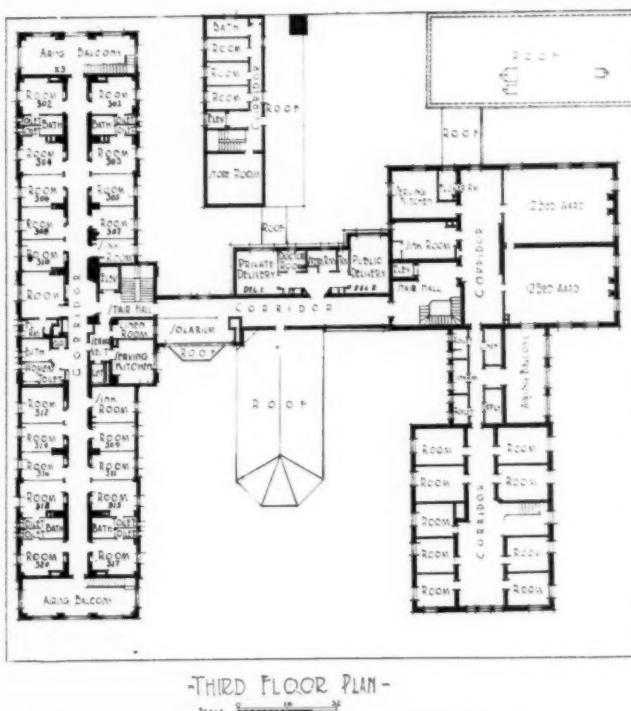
Harrisburg Hospital showing connection of maternity department with new building.
